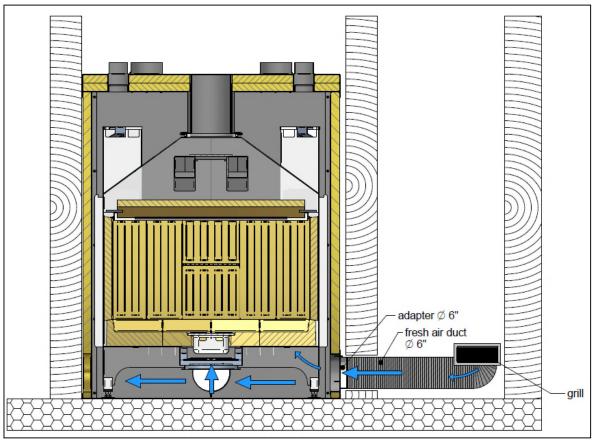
connection from the outside directly to the unit with installation of a closure valve IF YOU CONNECT THE SEPARATE COMBUSTION AIR DIRECTLY TO THE UNIT THE CLOSURE VALVE HAS TO BE OPEN WHILE BURNING. ONLY CLOSE THE VALVE WHEN THE FIREPLACE IS NOT IN USE. INOBSERVANCE MAY CAUSE THE FIRE TO BE EXTINGUISHED BECAUSE OF NO PROVISION OF COMBUSTION AIR.
